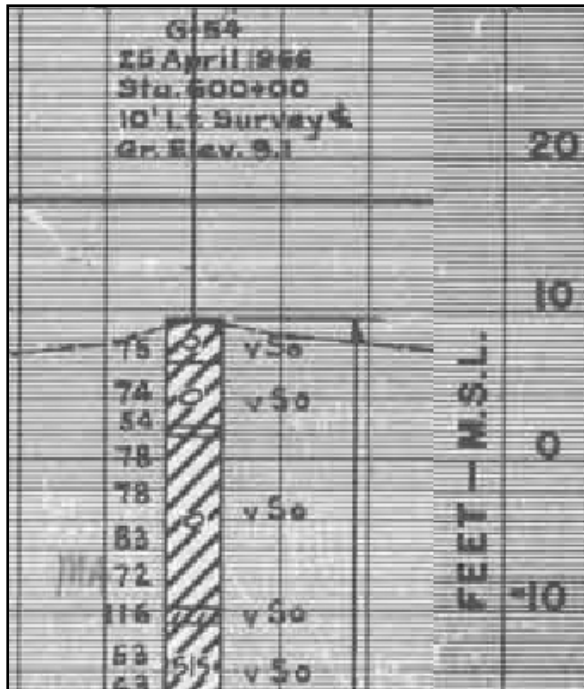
Nearest Boring at 10 ft Offset from B/L Sta 600+00 (from drawing file H-2-23820, plate 13) Shows 1966 Hydraulic Fill (dredge spoil) Surface at Elevation 10 ft Was Very Soft Fat Clay
